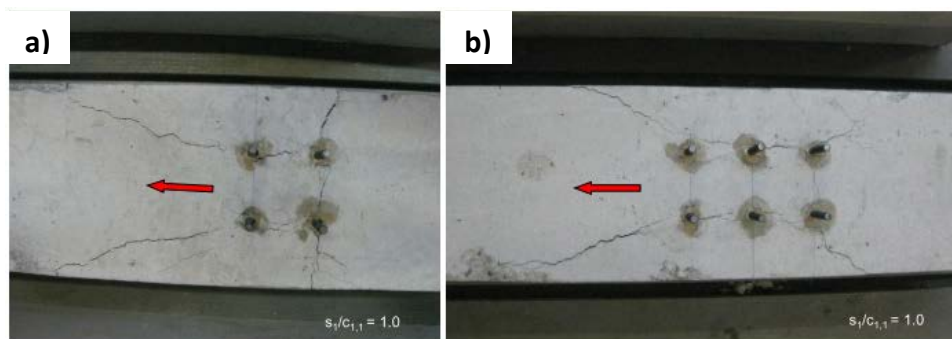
Failure patterns of anchor groups in narrow concrete members loaded parallel to free edge failing in concrete breakout for (a) four-anchor group, and (b) six-anchor group (Grosser 2012)
